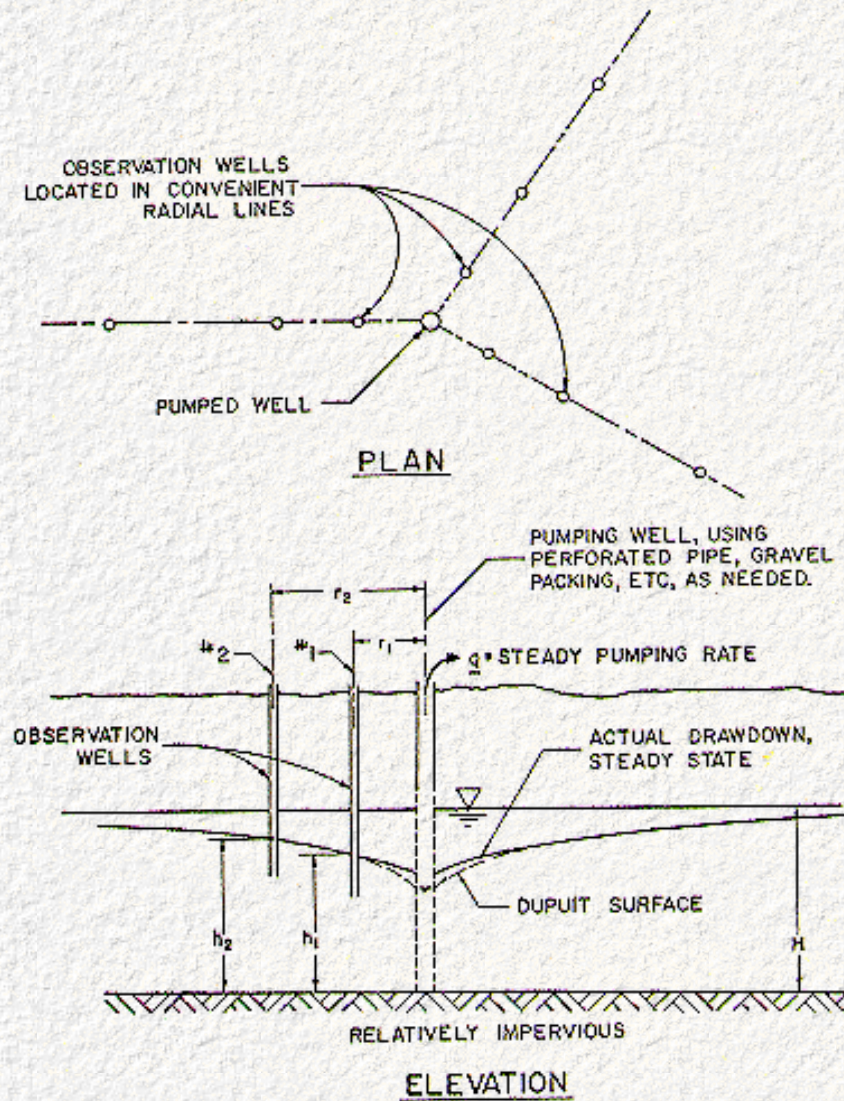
A Typical Arrangement for a Well Pumping Test
